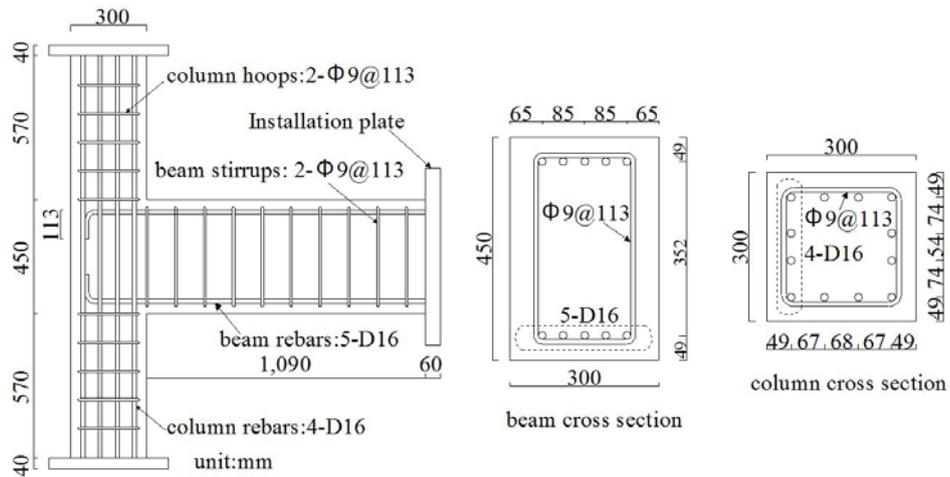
Dimensions and reinforcement details of the existing part of the specimens.
